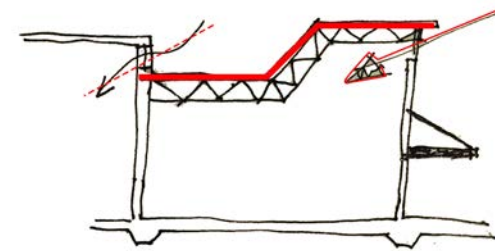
Greenhouse section sketch 6 (Author 2018)
